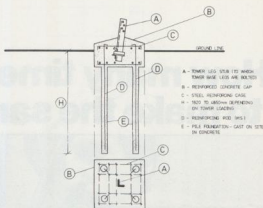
PILED FOUNDATIONS FOR TOWERS
